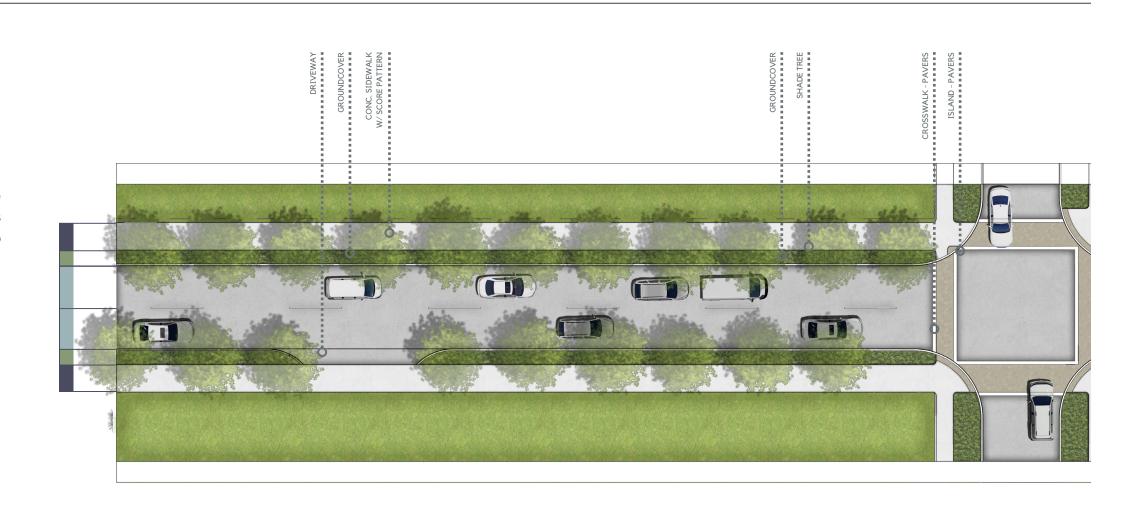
B.1 Wallis Street Typology | 50' ROW
